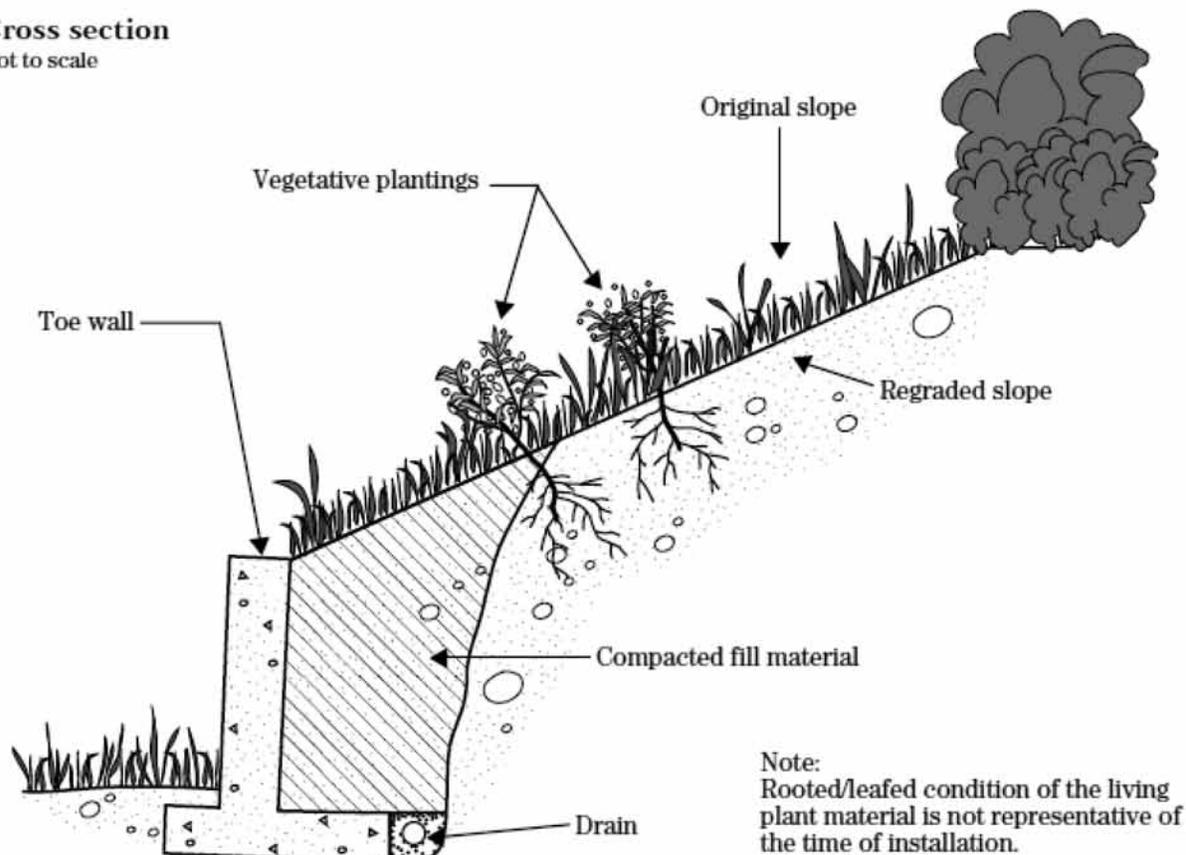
Cross section of a low wall with vegetation planted on the slope for stabilization (USDA 1992).
